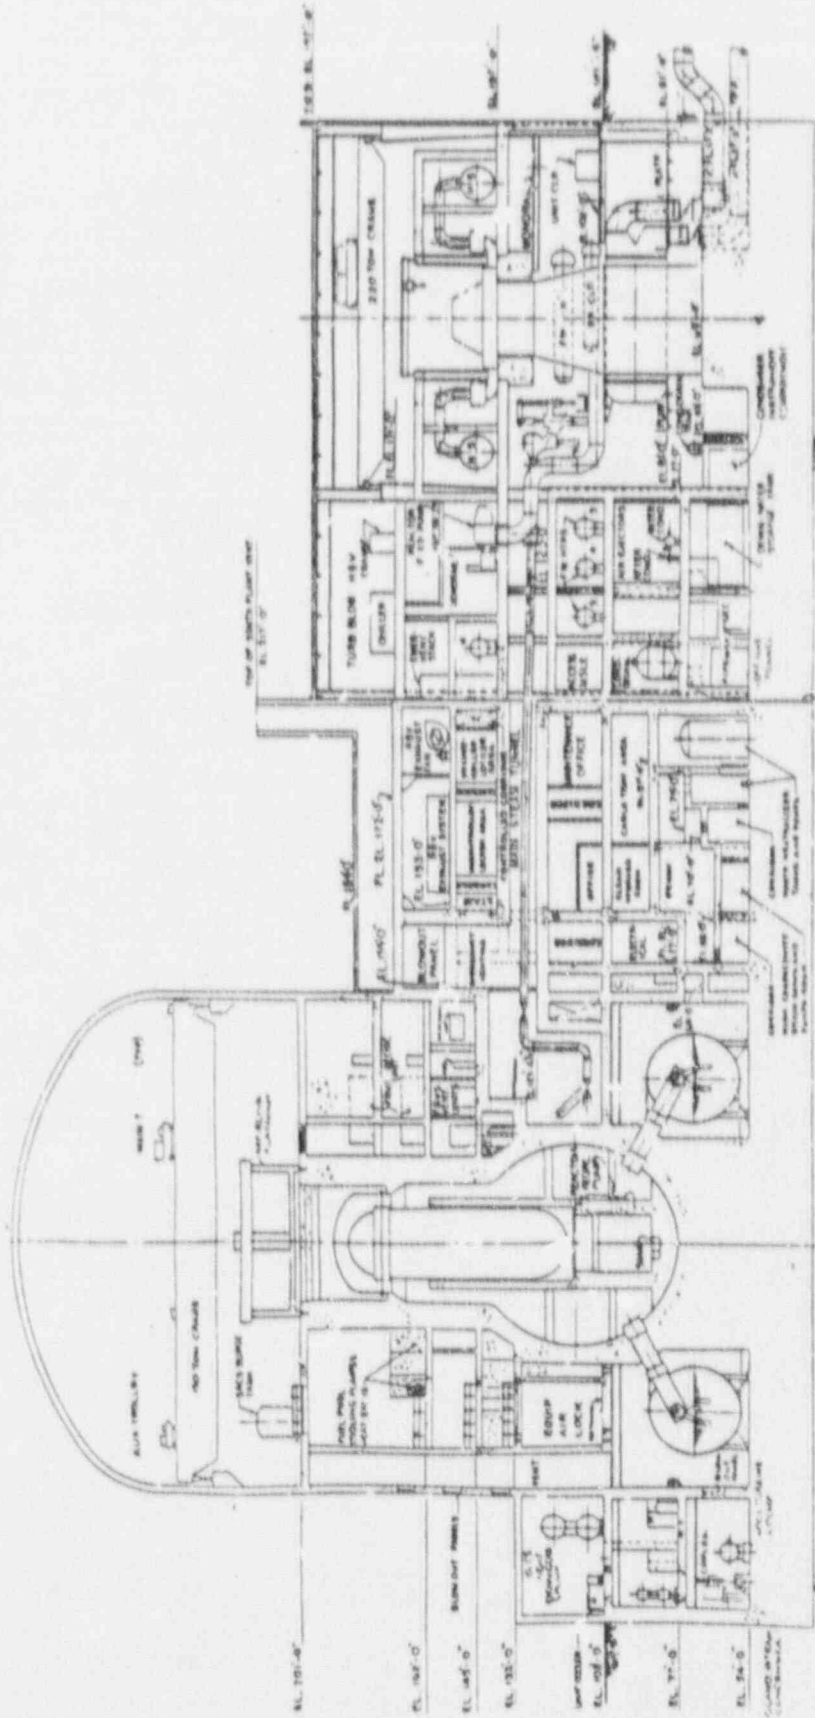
Hope Creek Reactor Building Section, Looking North
